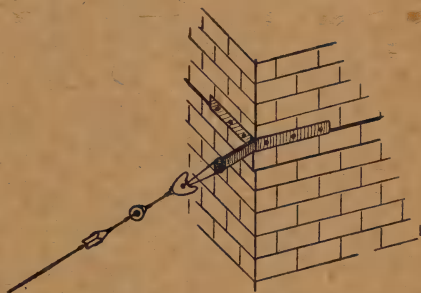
Corner-bracket Attachment for Chimney or Corner of Building
